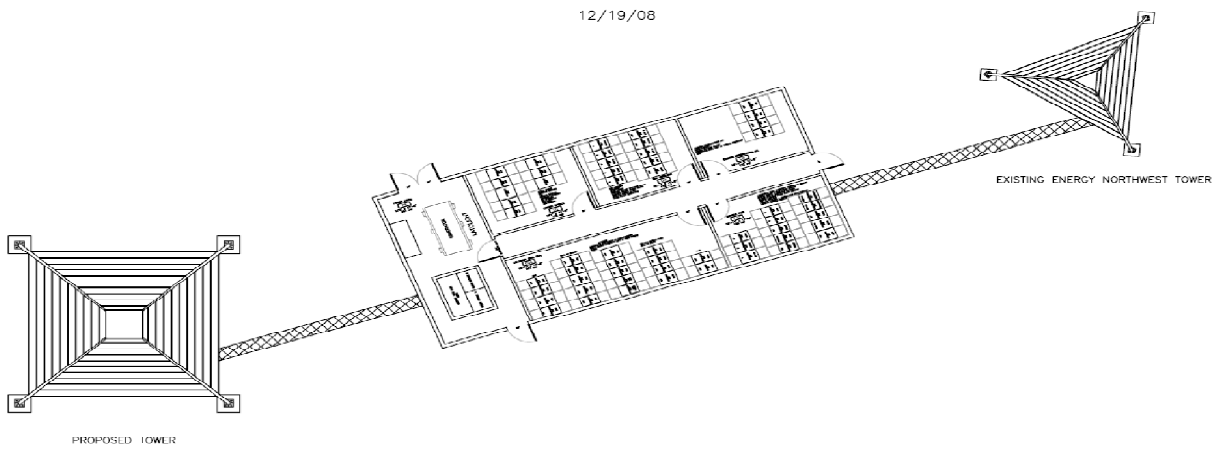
Conceptual Plan View of the Proposed CCCF
